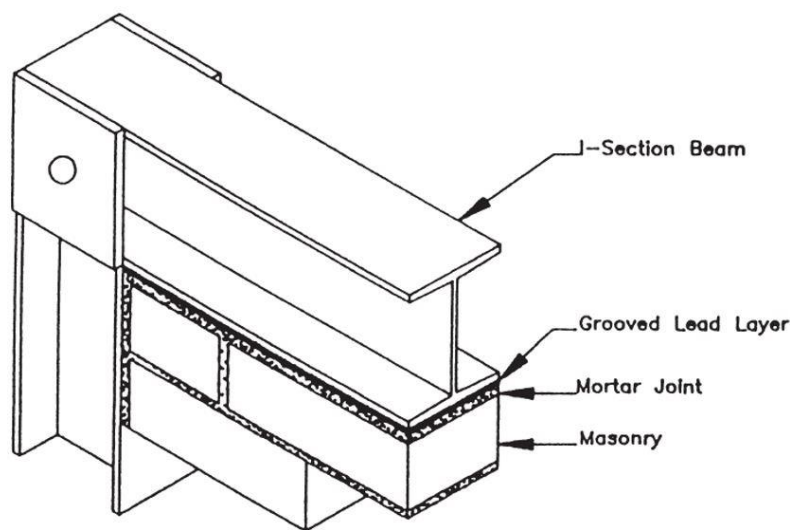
Typical section detail of the frame-infill joint [from Sahota and Riddington (2001)].
